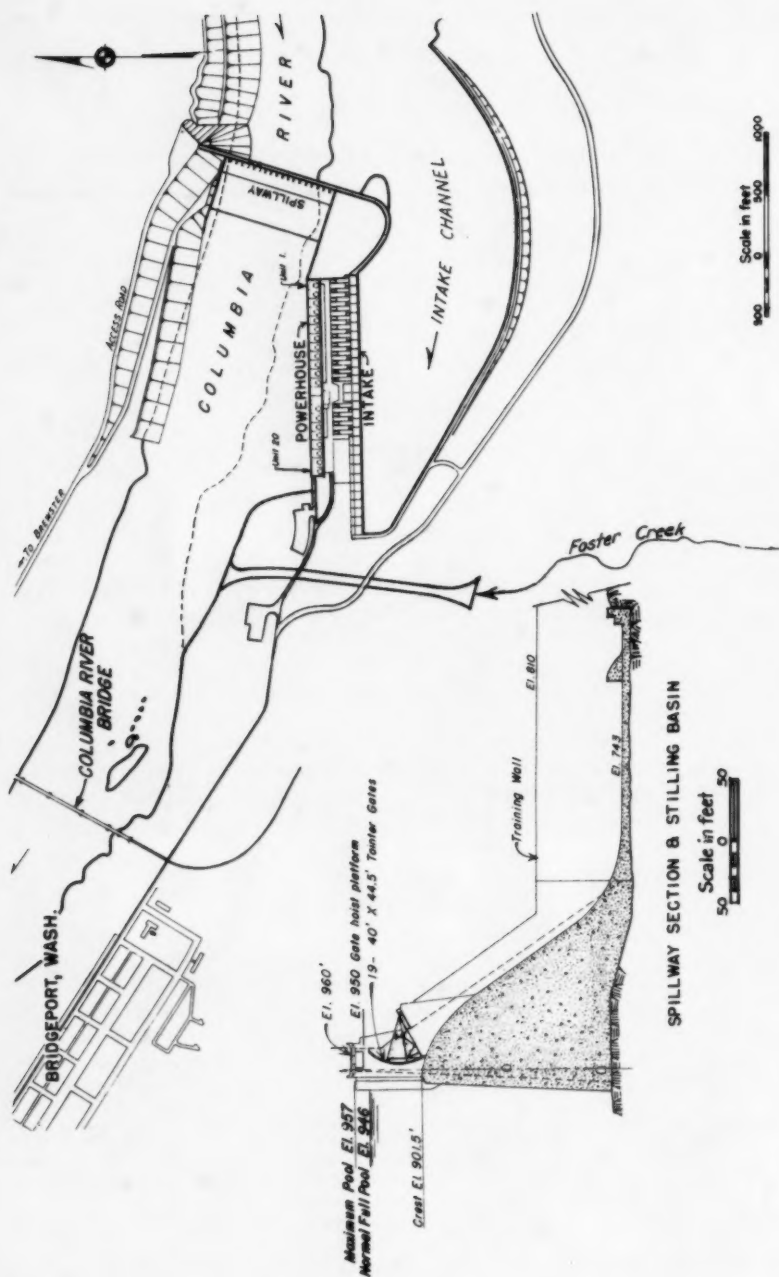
PLAN OF DAM AND POWERHOUSE
